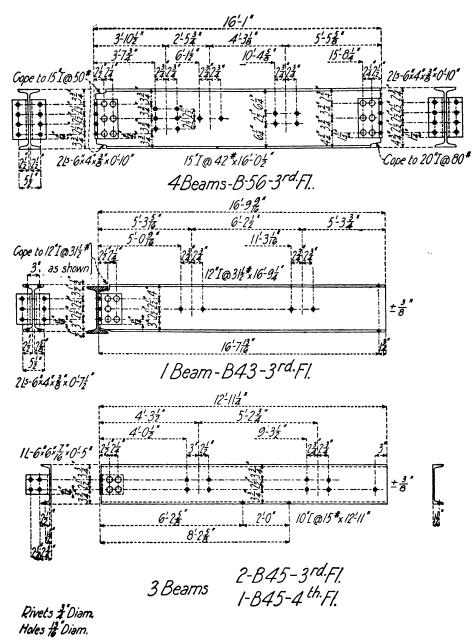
STANDARD DETAILS FOR ROLLED BEAMS.
